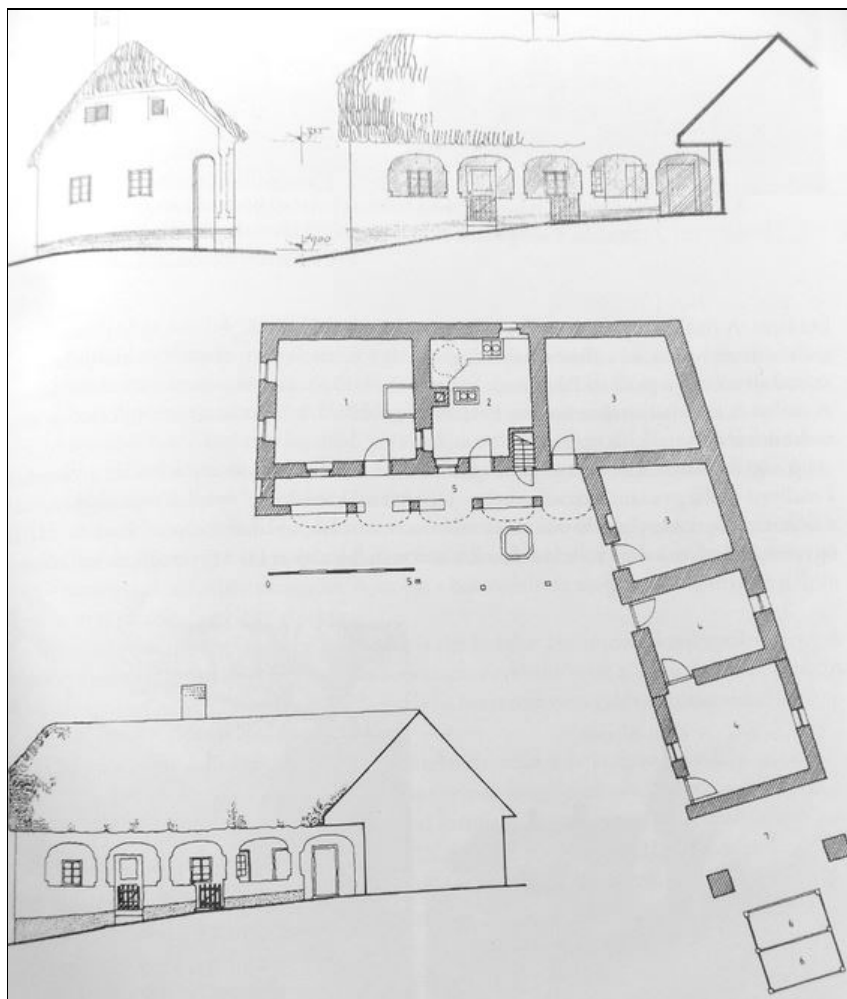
Bended layout of house with porch, Andovci, 1973.
